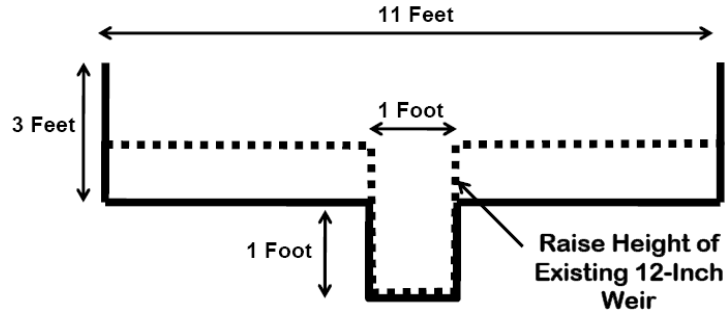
Ukrainian Village Pond - Proposed Modification to Outlet Structure
